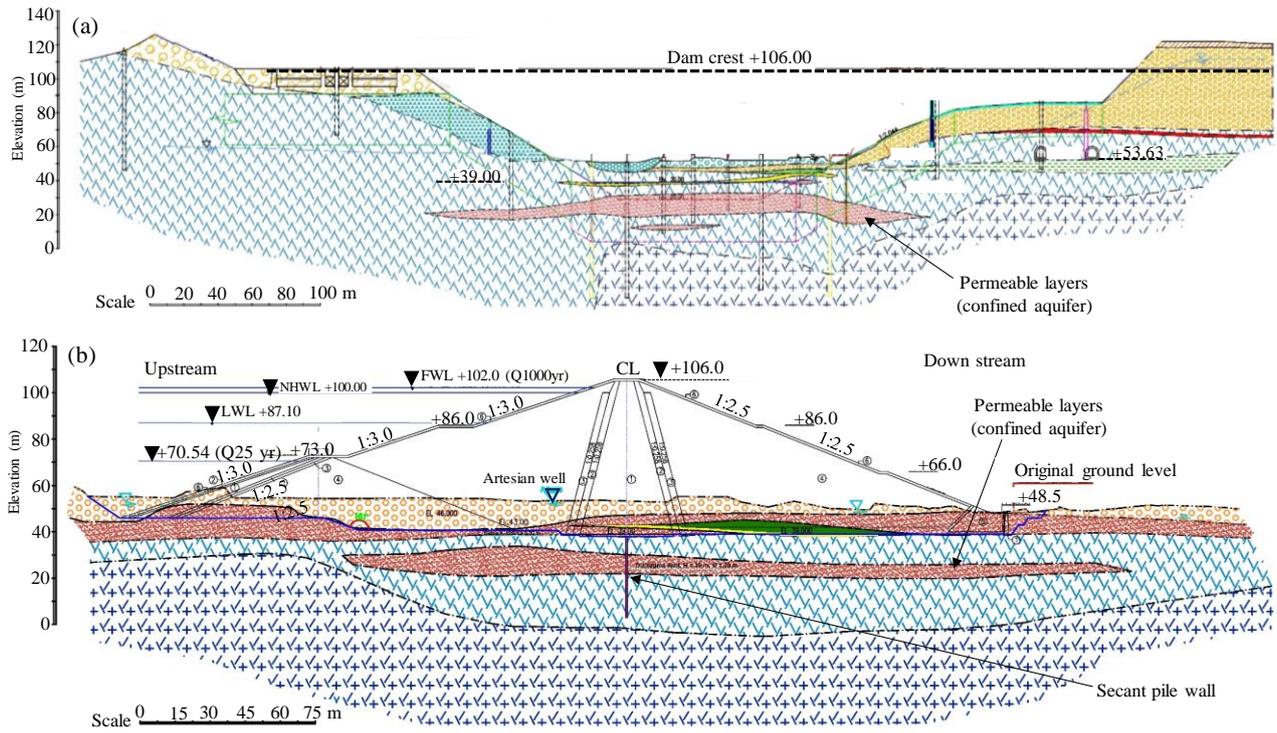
Dam design after additional site characterization: (a) long section and (b) cross section
